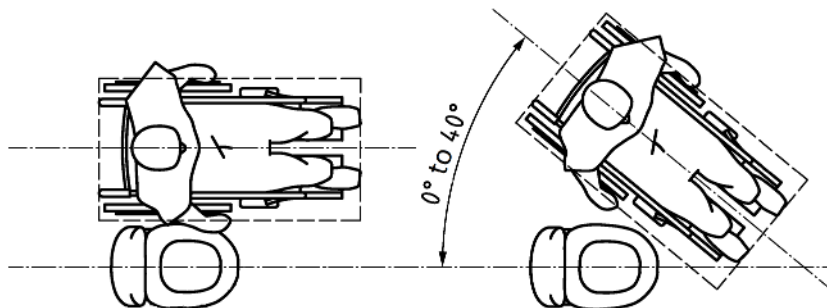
Example for a lateral or side approach for right hand transfer to toilet seat
